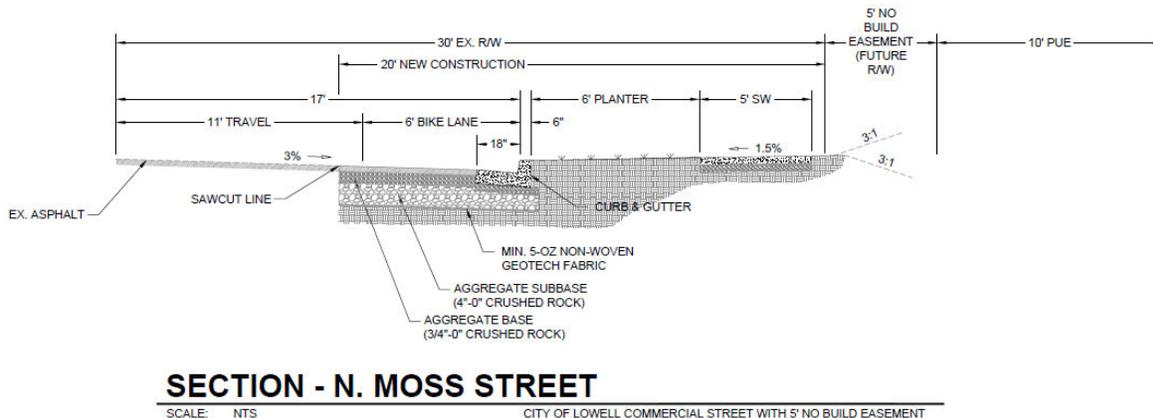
Applicant proposed urban street improvements along frontage of North Moss Street.
